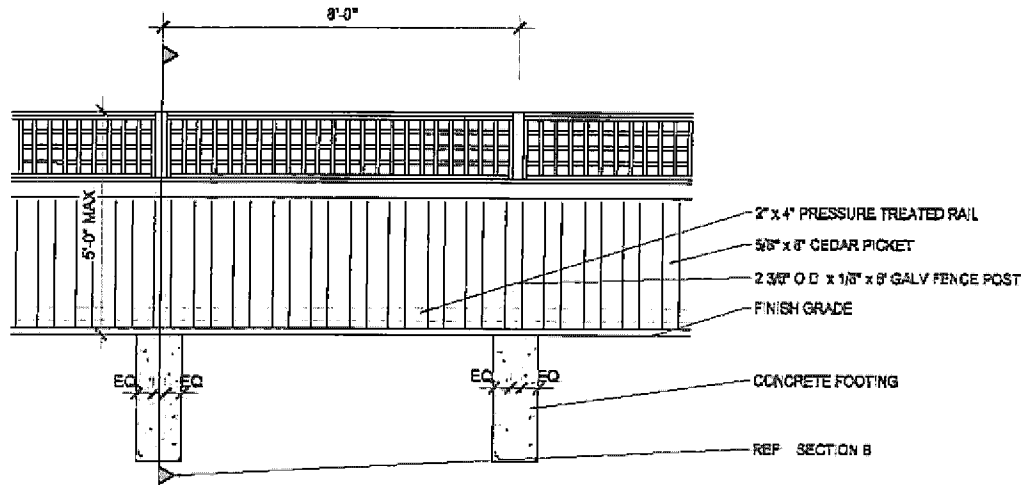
EXHIBIT A: SCREENING WALLS, FENCES & RETAINING WALLS
